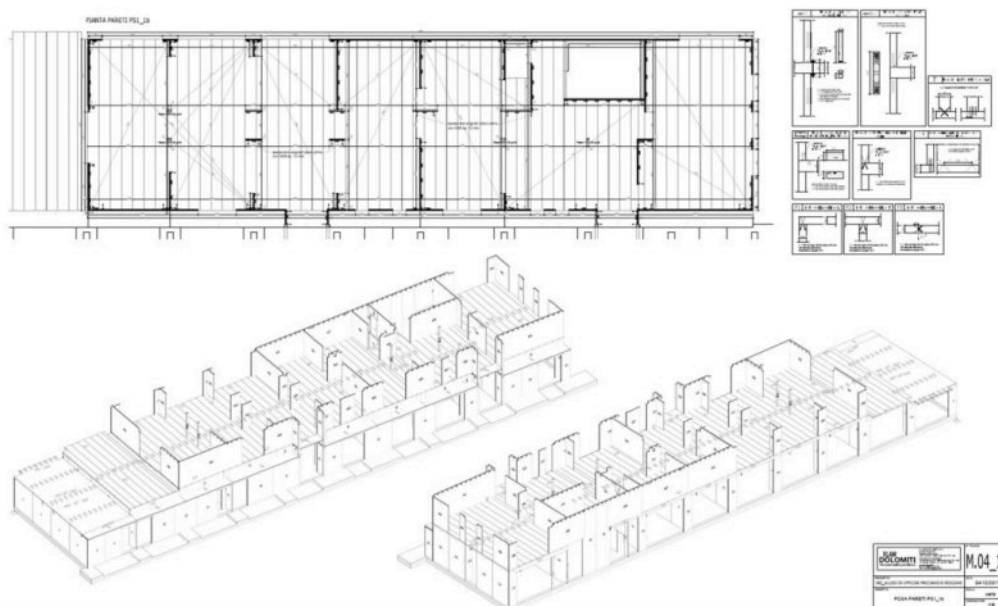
Executive drawings for the installation of the wall panels of the second floor (1b building).
